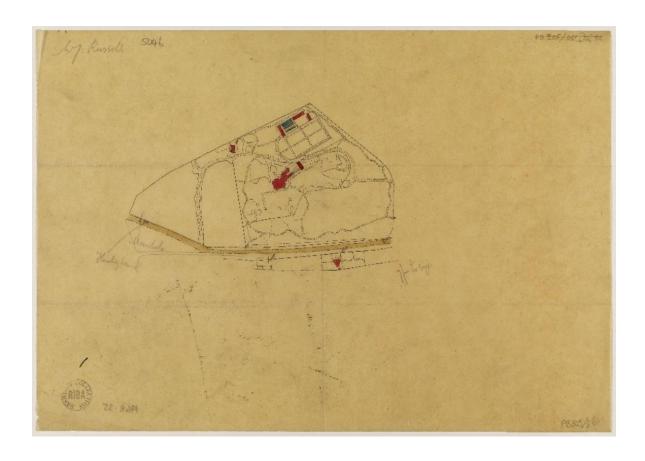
The plan for house and garden, Coombe Warren. RIBA PB805/1.
